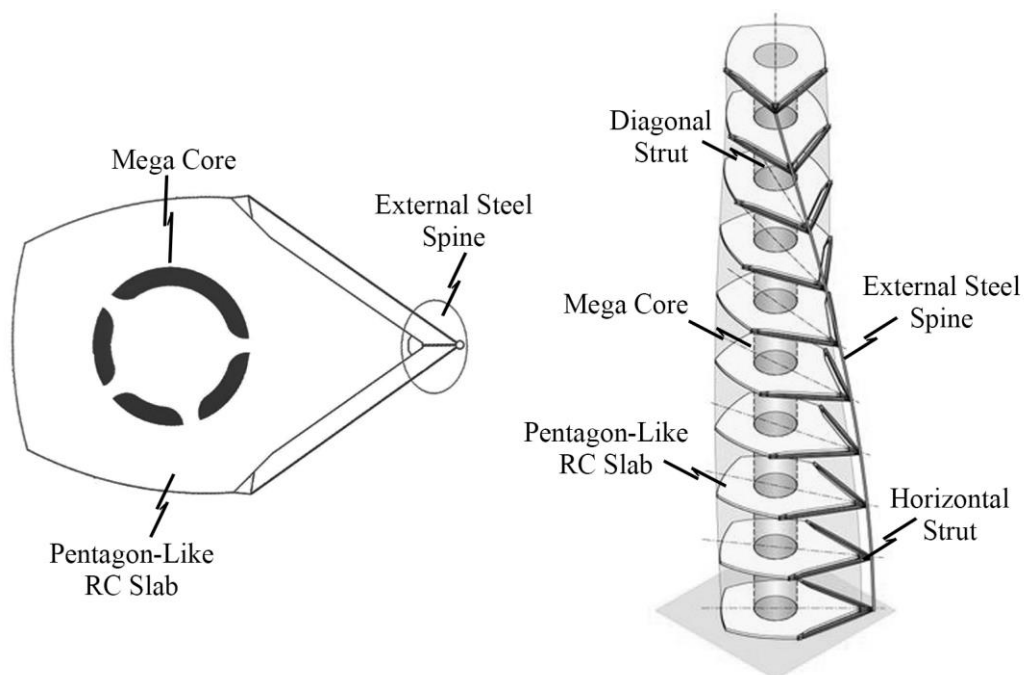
Turning Torso; typical floor plan (left) (Adapted from Günel & Ilgın, 2014) and 3D projection of structural system (right) (Adapted from Wikipedia, 2004)
